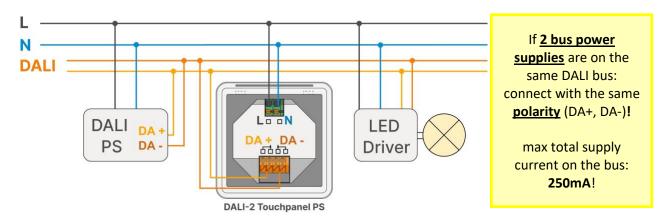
installation example DALI-2 Touchpanel PS with an additional DALI PS on the DALI bus
